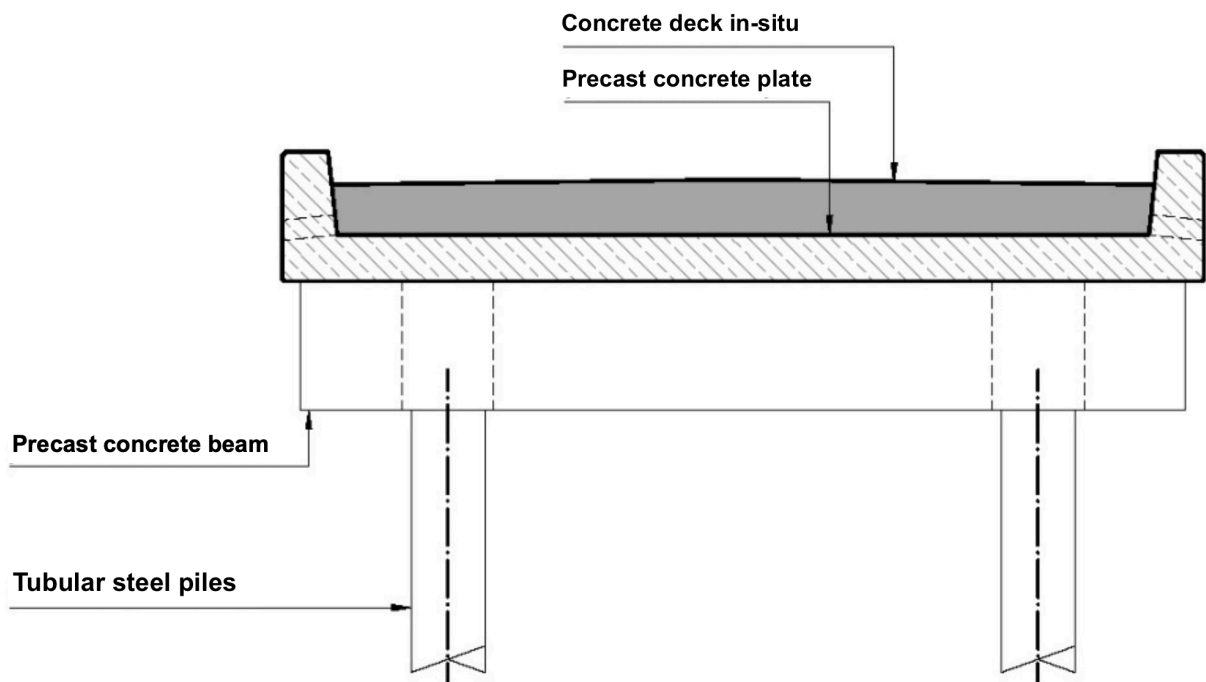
Main cross-section piles with prefab beams, changed to tubular steel piles (SBRCURnet, 2018b)
